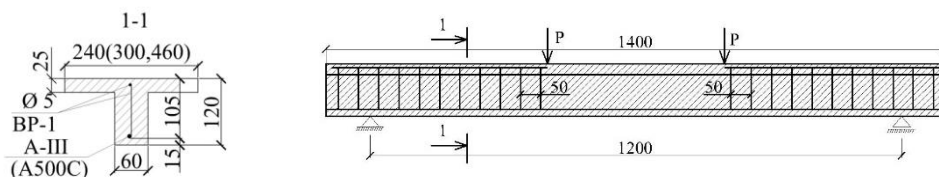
Reinforcement scheme and location of T-beams on supporting elements
